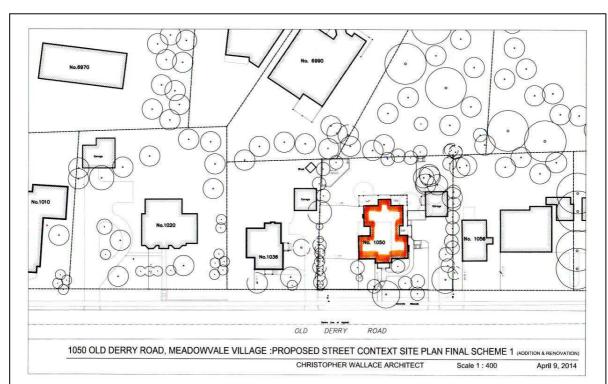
Renovation proposal, April 2014. Streetscape site plan. Open spaces between buildings form a consistent pattern.
